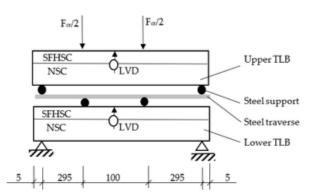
Dimensions and loading pattern of the investigated double-layer reinforced concrete beams (DLRB)
